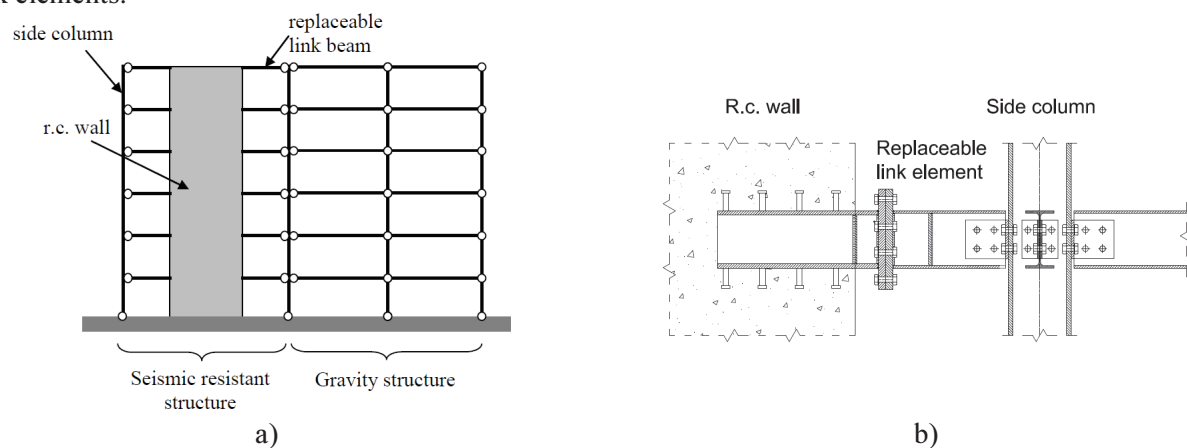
Innovative hybrid coupled shear wall system: a) structural scheme; b) replaceable link
